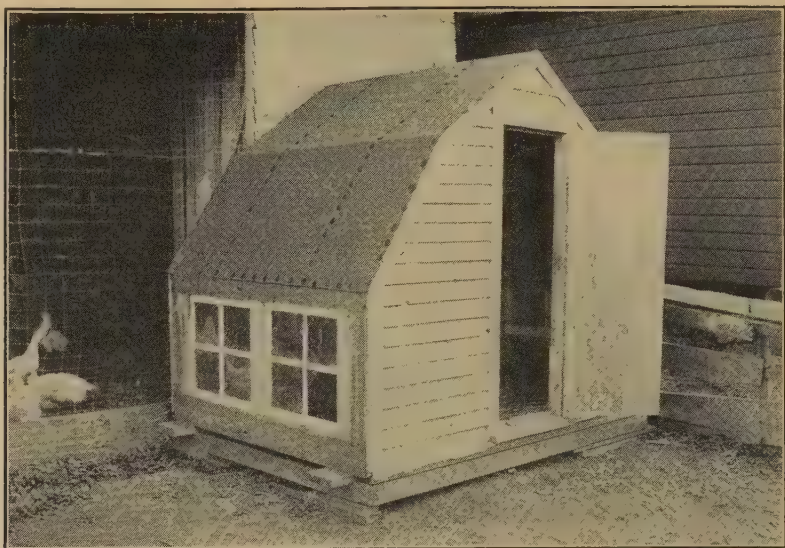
A POULTRY HOUSE BUILT OF TWO PIANO BOXES AND SOME WASTE SIDING AT CHIPPEWA FALLS, WIS.
